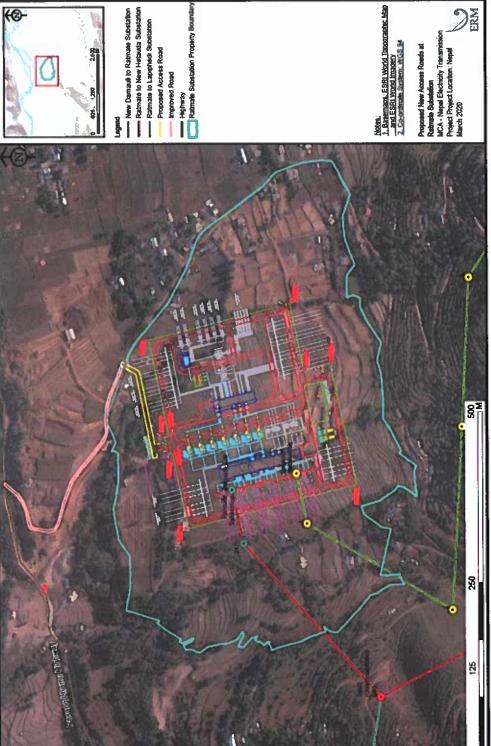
Proposed New Access Roads at Ratmate Substation
